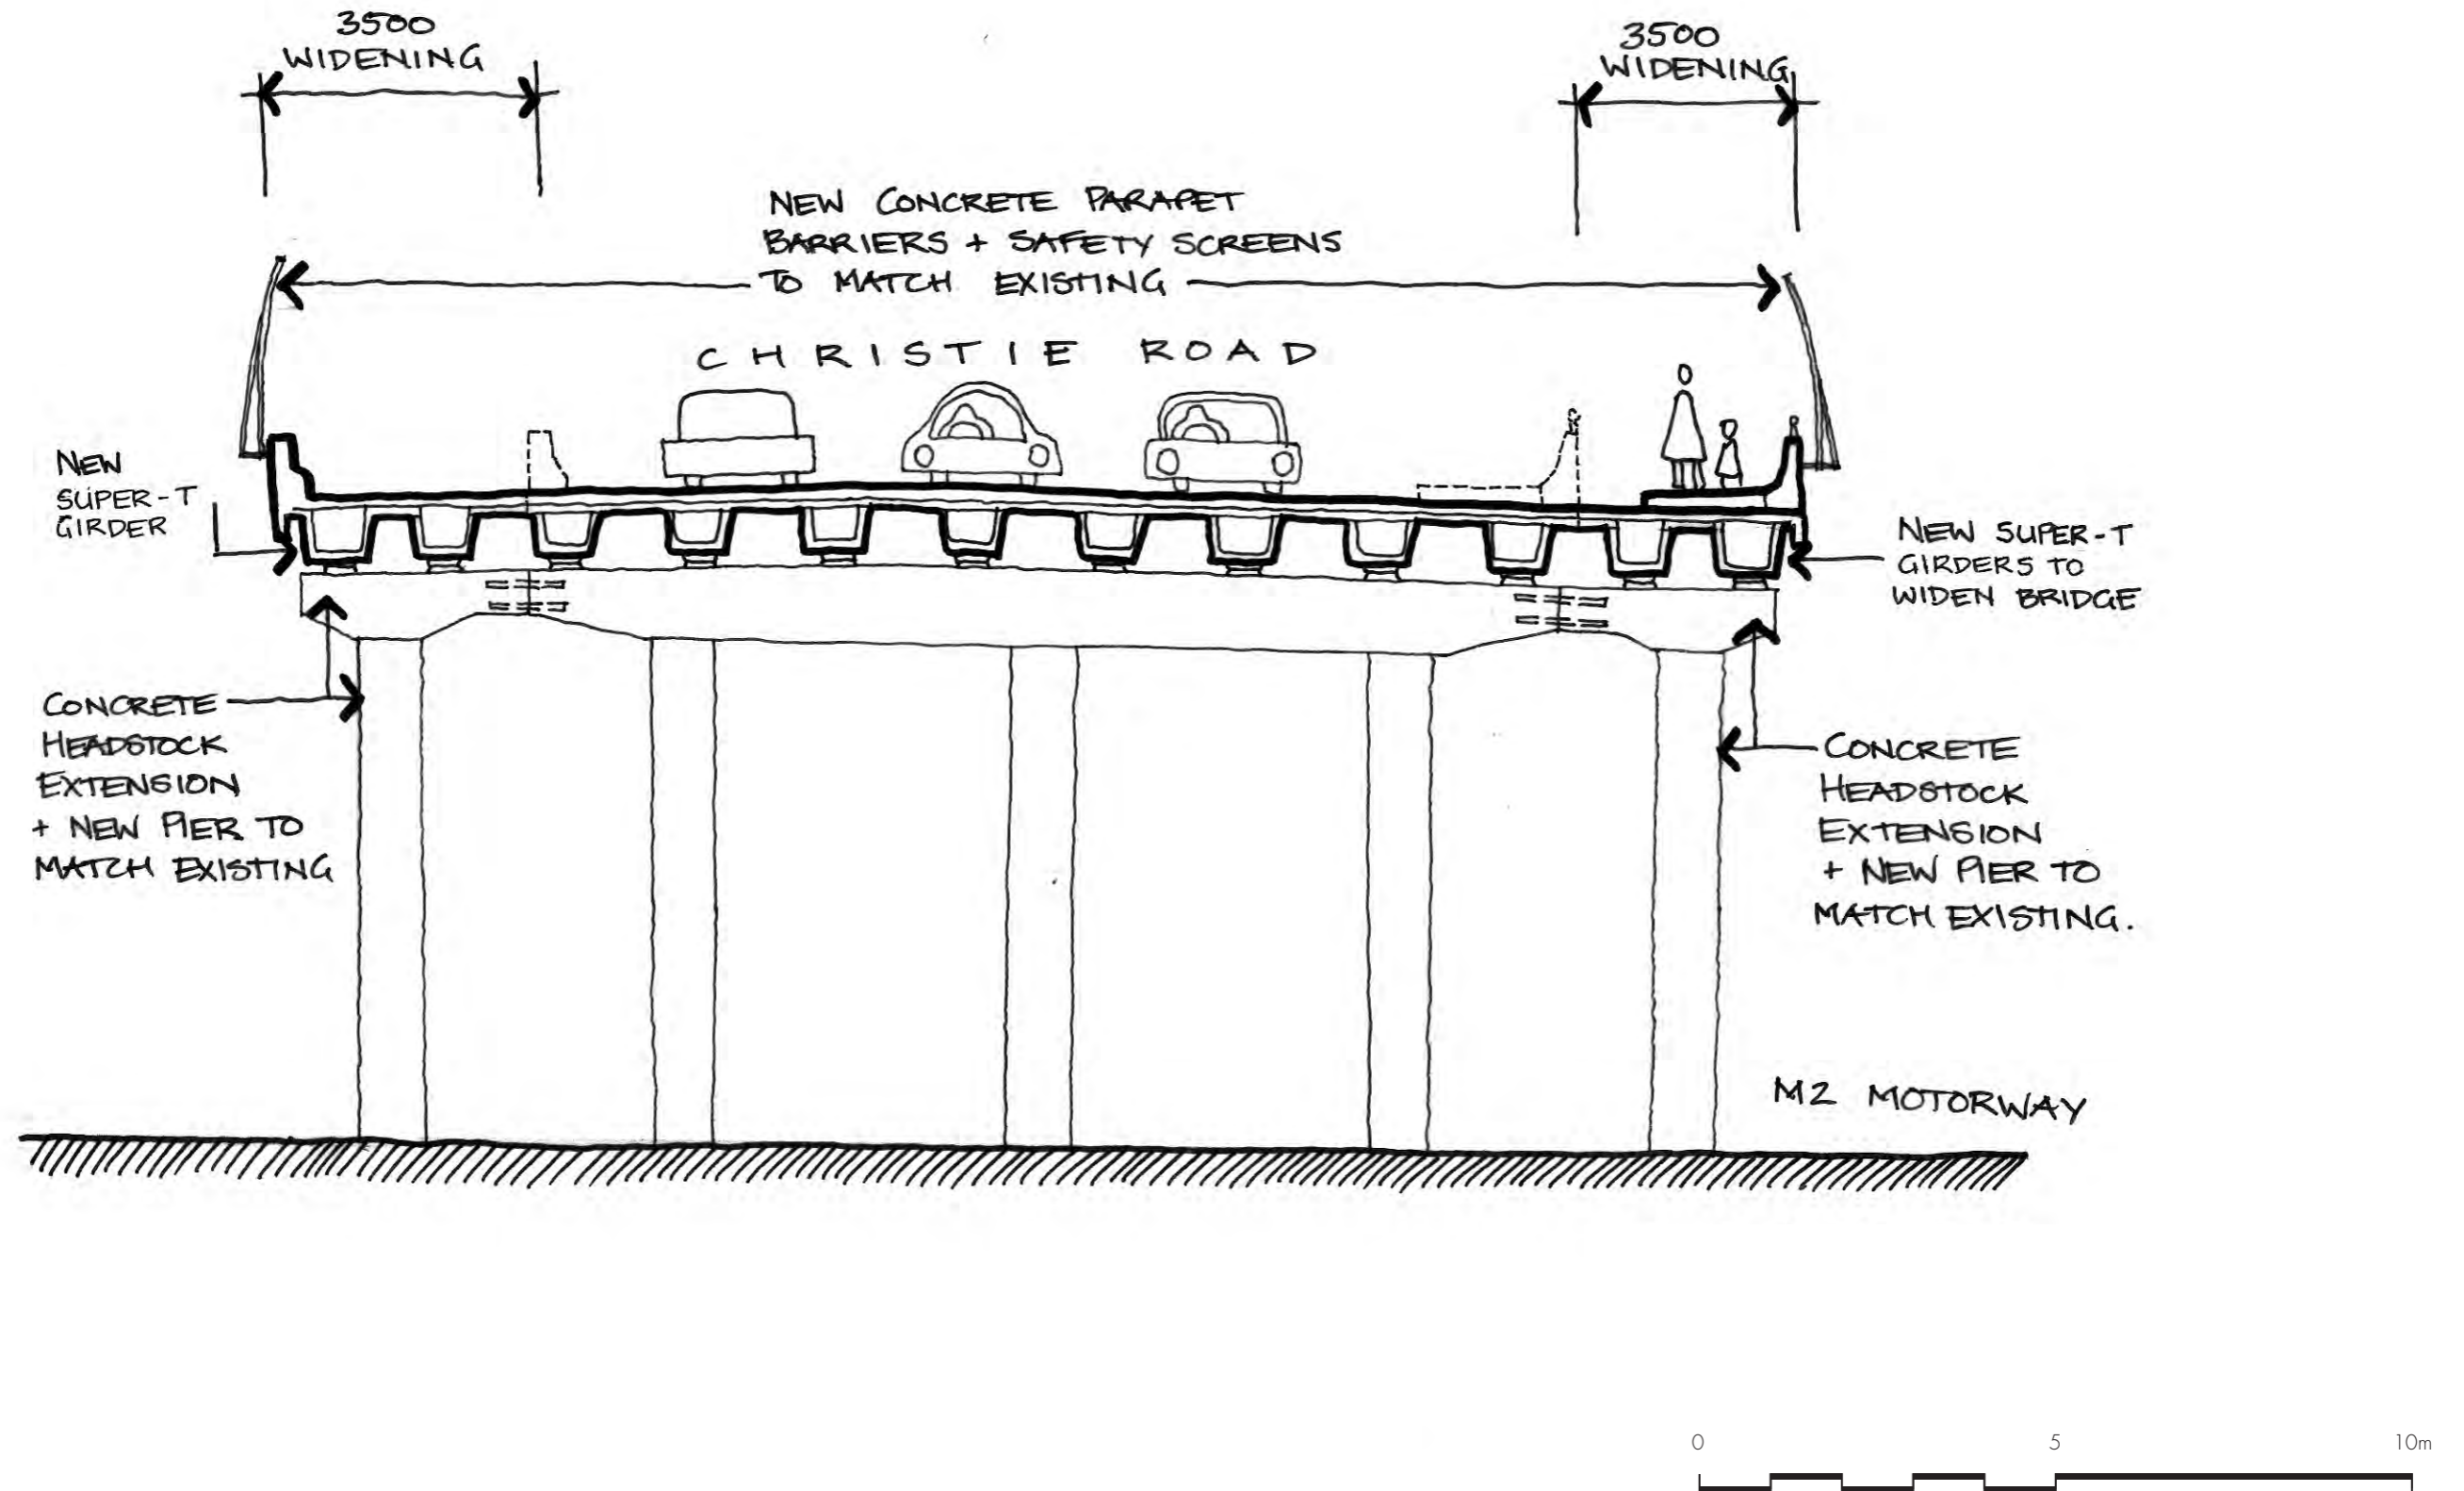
Bridge 5.1 Christie Road Bridge - Cross Section
